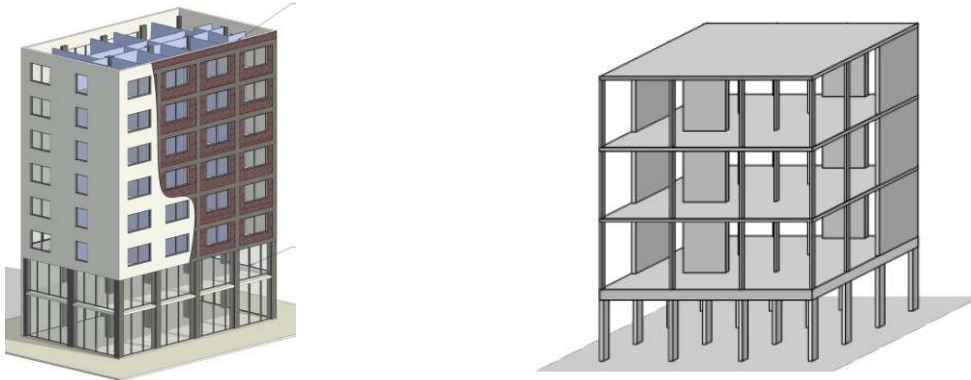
Left: variable storey height. Right: discontinuity of structural walls in elevation
